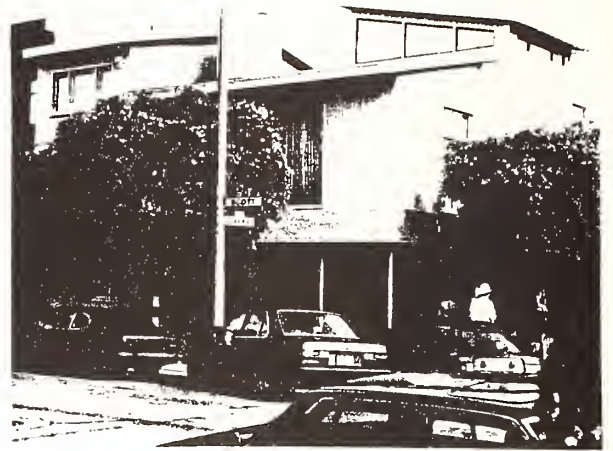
Plywood sheathed and sided apartment building near the building shown in Figure 9. Except for the badly damaged concrete garage floor, this building had minor damage.
